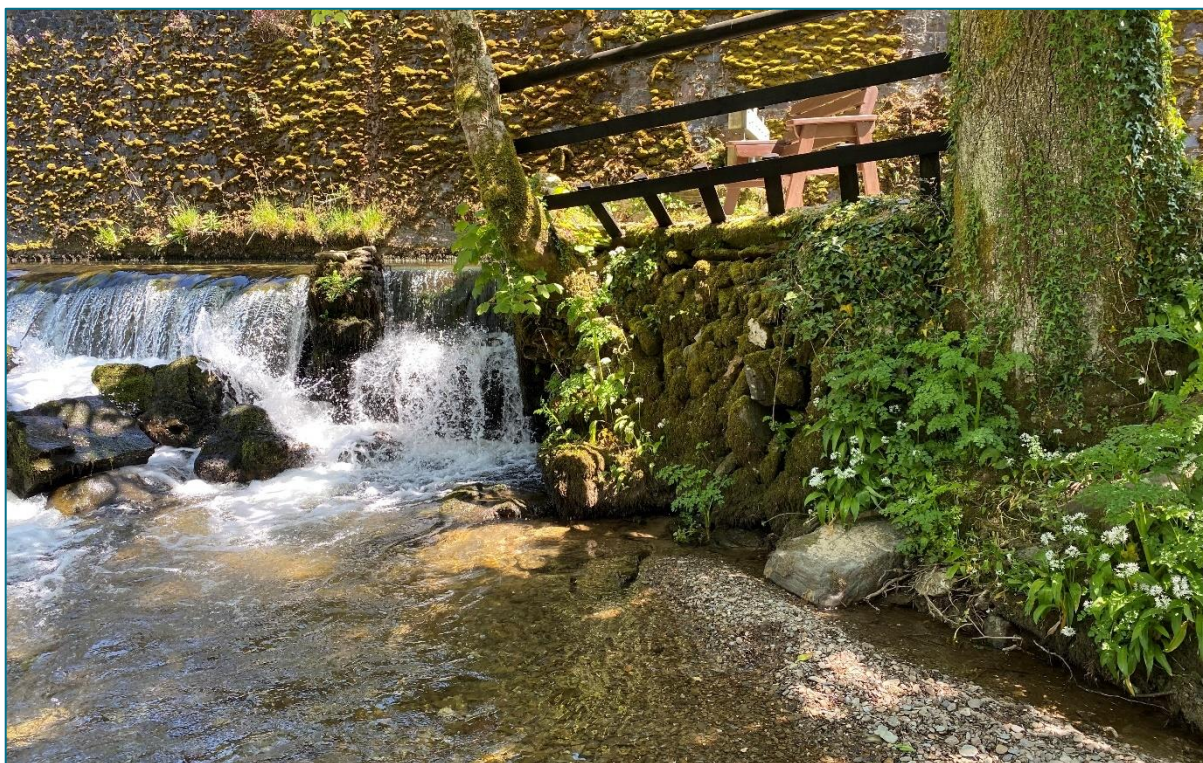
Detail of area for smolt chute and riparian wall (looking east).
